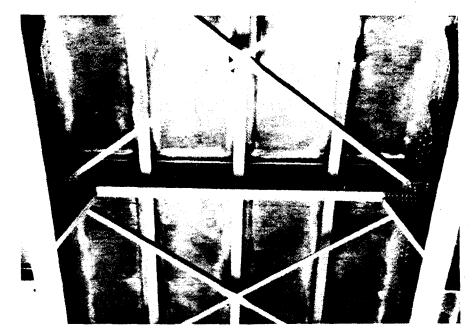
Two-Girder Bridge With a Girder-Floorbeam-Stringer System
